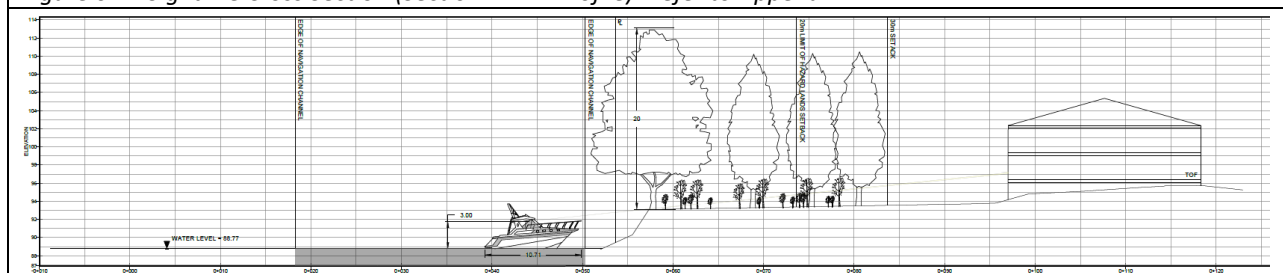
Sightline Cross Section (Section B – B' Profile). Refer to Appendix A
